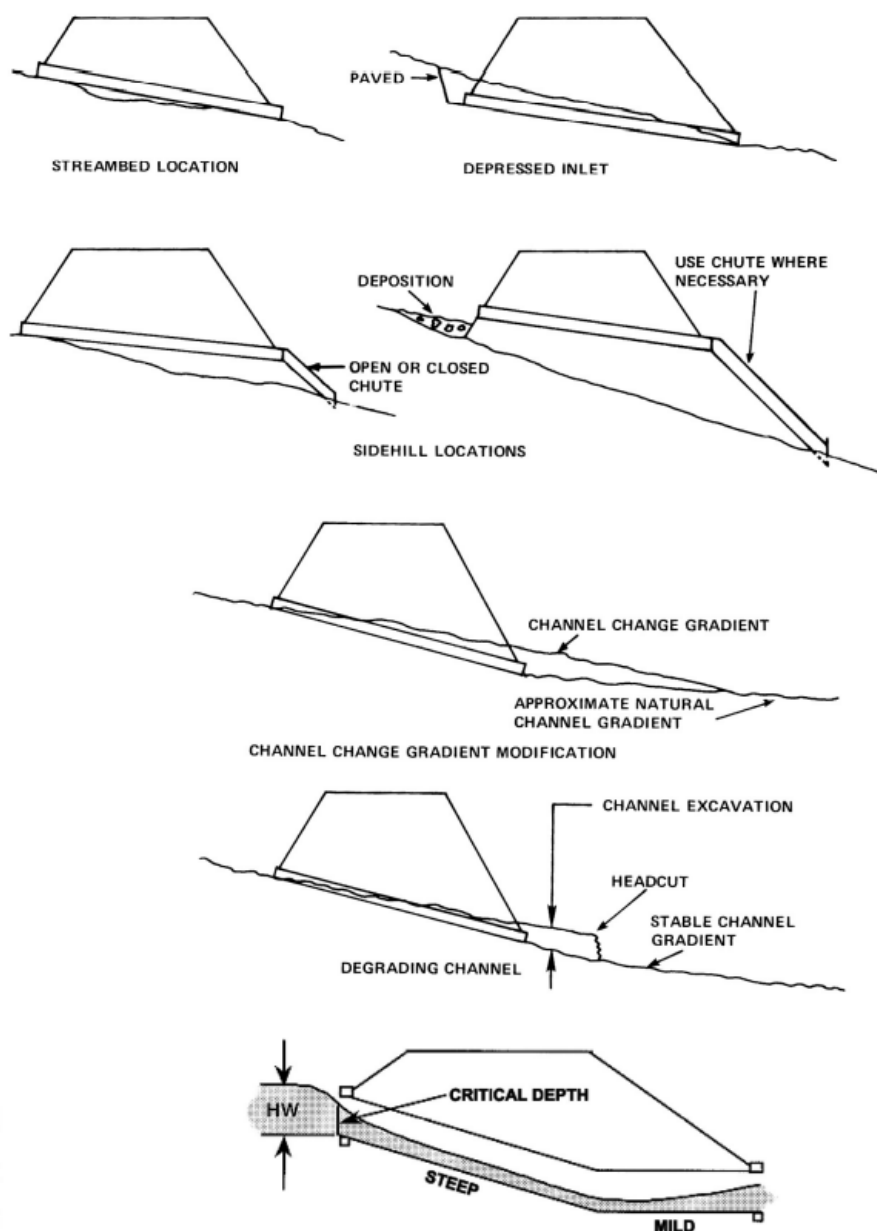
Methods of Culvert Location Where Location in the Natural Channel Would Involve an Inordinately Long Culvert
